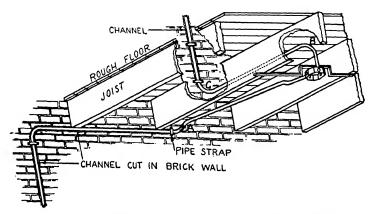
Method of Installing Conduit to Outlet Box over the Vestibule in Public Hall
